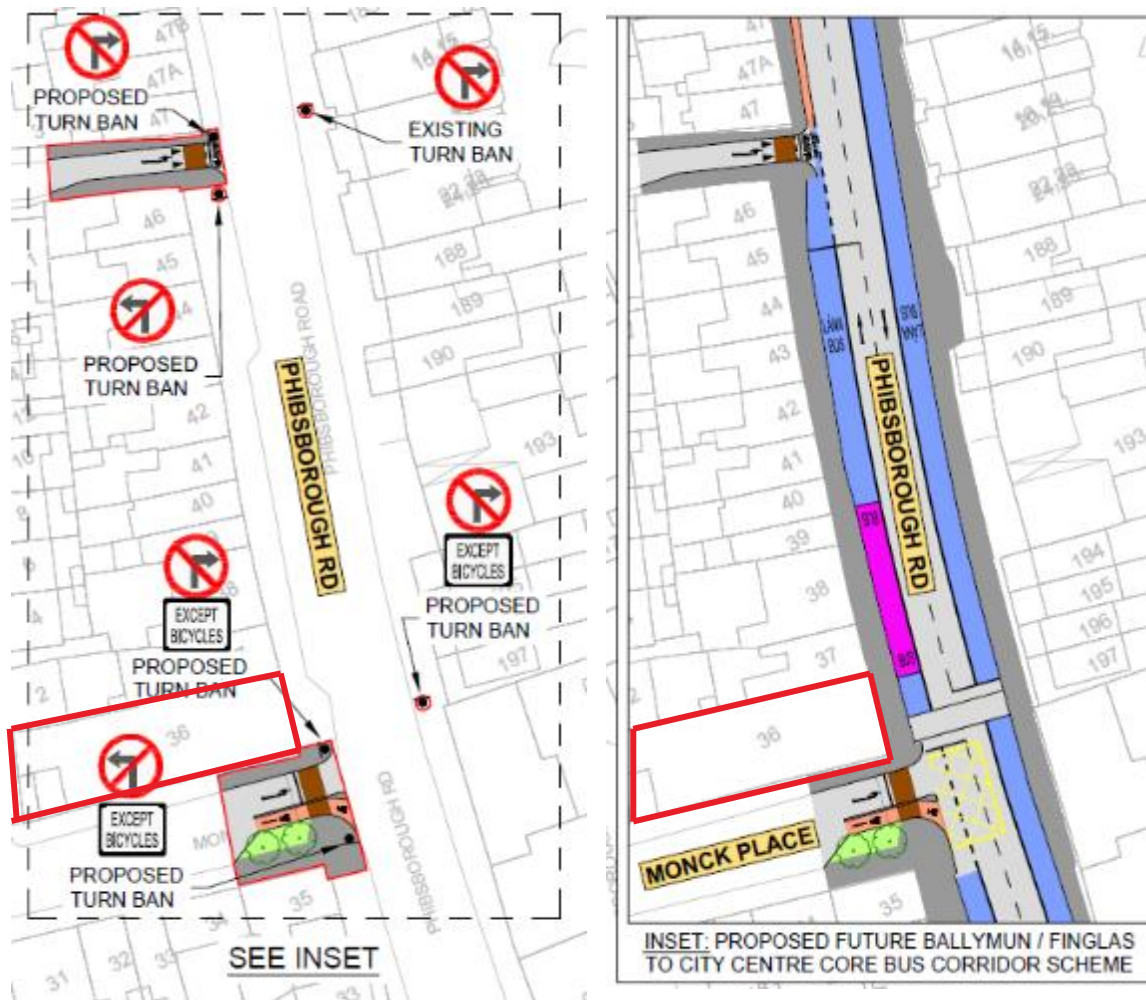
Extracts from General Arrangement Drawings with 36 Phibsborough Road noted
